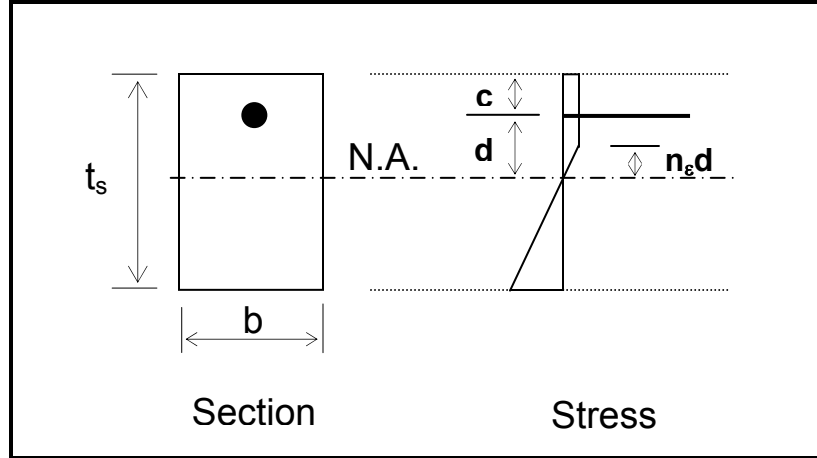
Section Dimension Used in Non-linear Sectional Analysis
